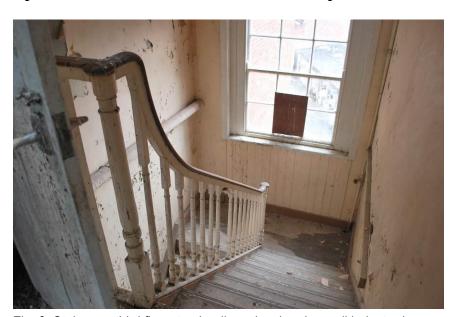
Staircase, third floor, top landing, showing drop rail balustrade.
